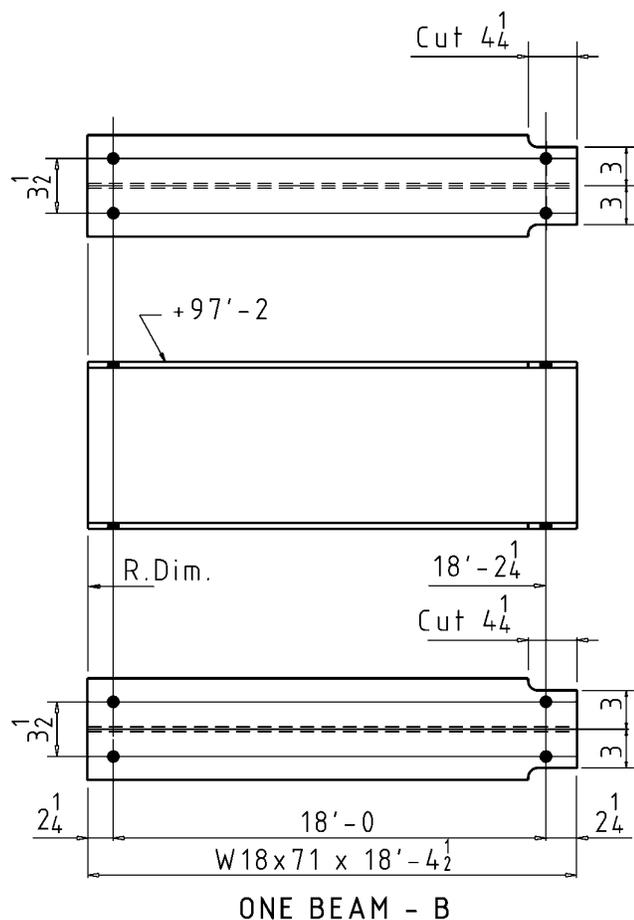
Completely developed shop detail of beam B with top and bottom views.
